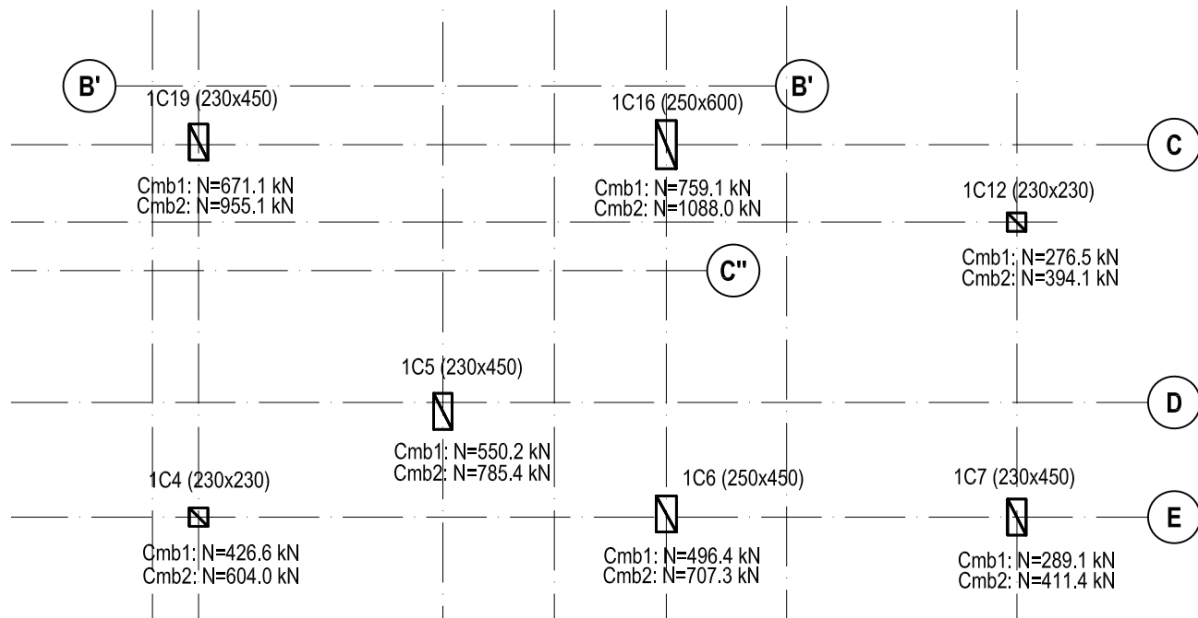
A: BLOWN-UP OF FOUNDATION LOADS AROUND THE PENT FLOOR
